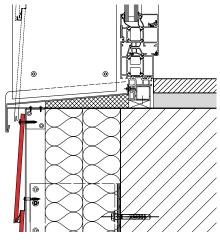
DETAILS OF CLAPBOARD FIXING WITH BRACKETS
